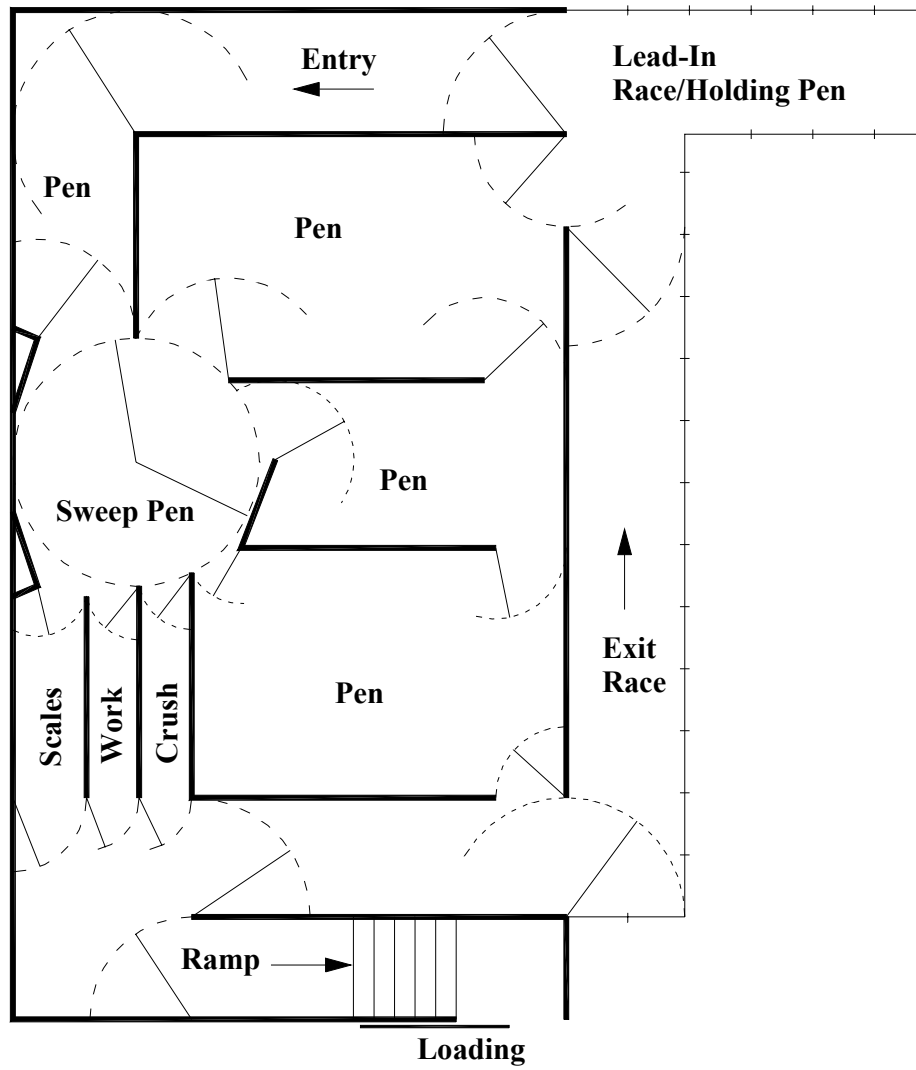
Diagrammatic layout of handling facilities for a large Red Deer herd built within an existing haybarn
